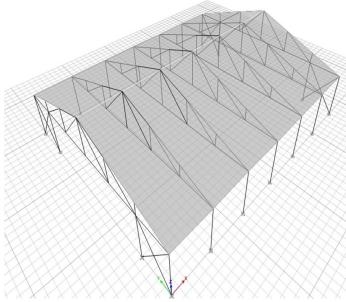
3-Dimensional model of Pre-Engineered Building having 30m span Pratt truss
